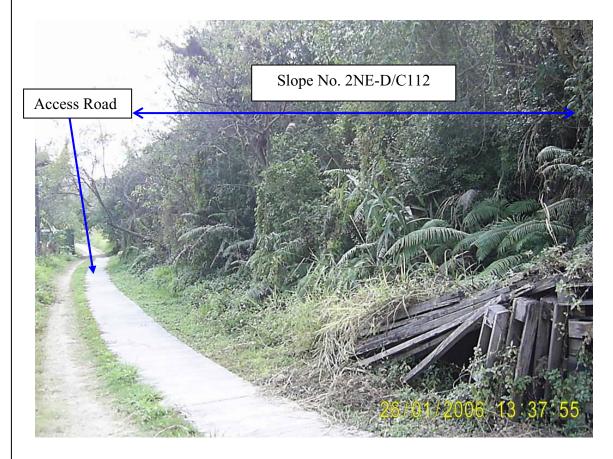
General View of the Slope No. 2NE-D/C112 (Looking South)
